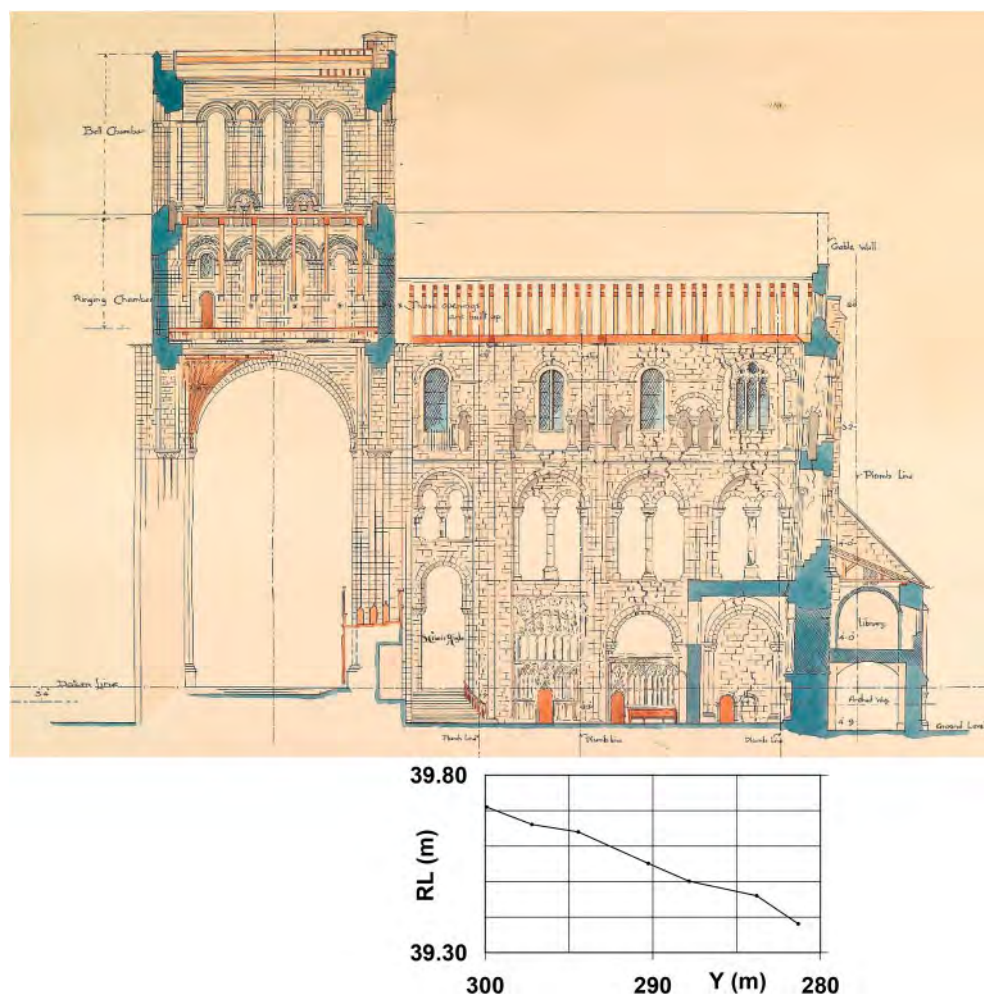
South Transept section through Tower and inside elevation looking East (Yu 2006).
